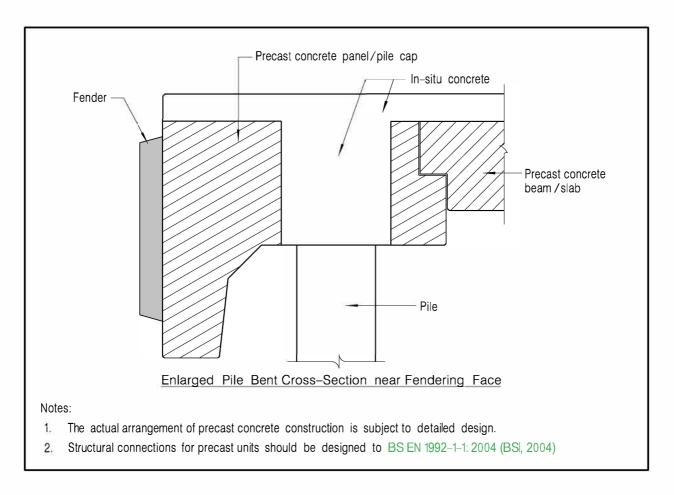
Precast Concrete Construction for Piled Deck Pier
